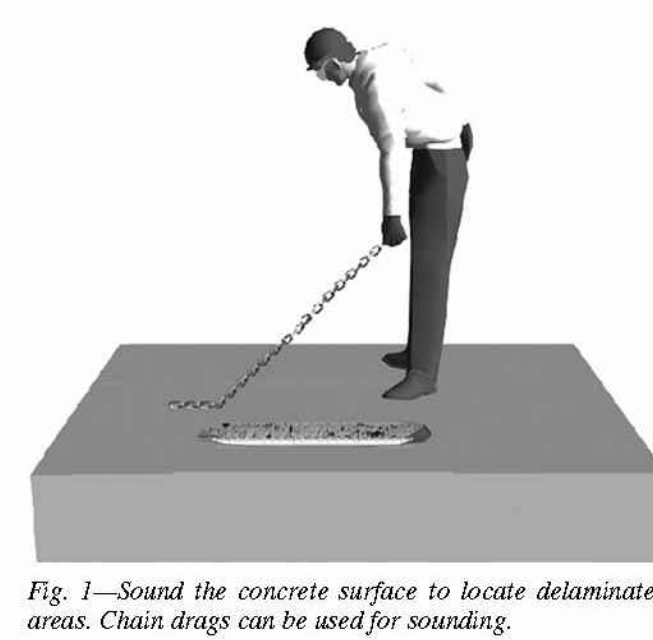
Sound the concrete surface to locate delaminated areas. Chain drags can be used for sounding.
